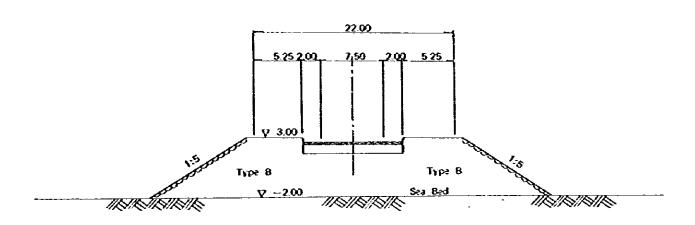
TYPICAL CROSS-SECTION OF APPROACH ROAD
